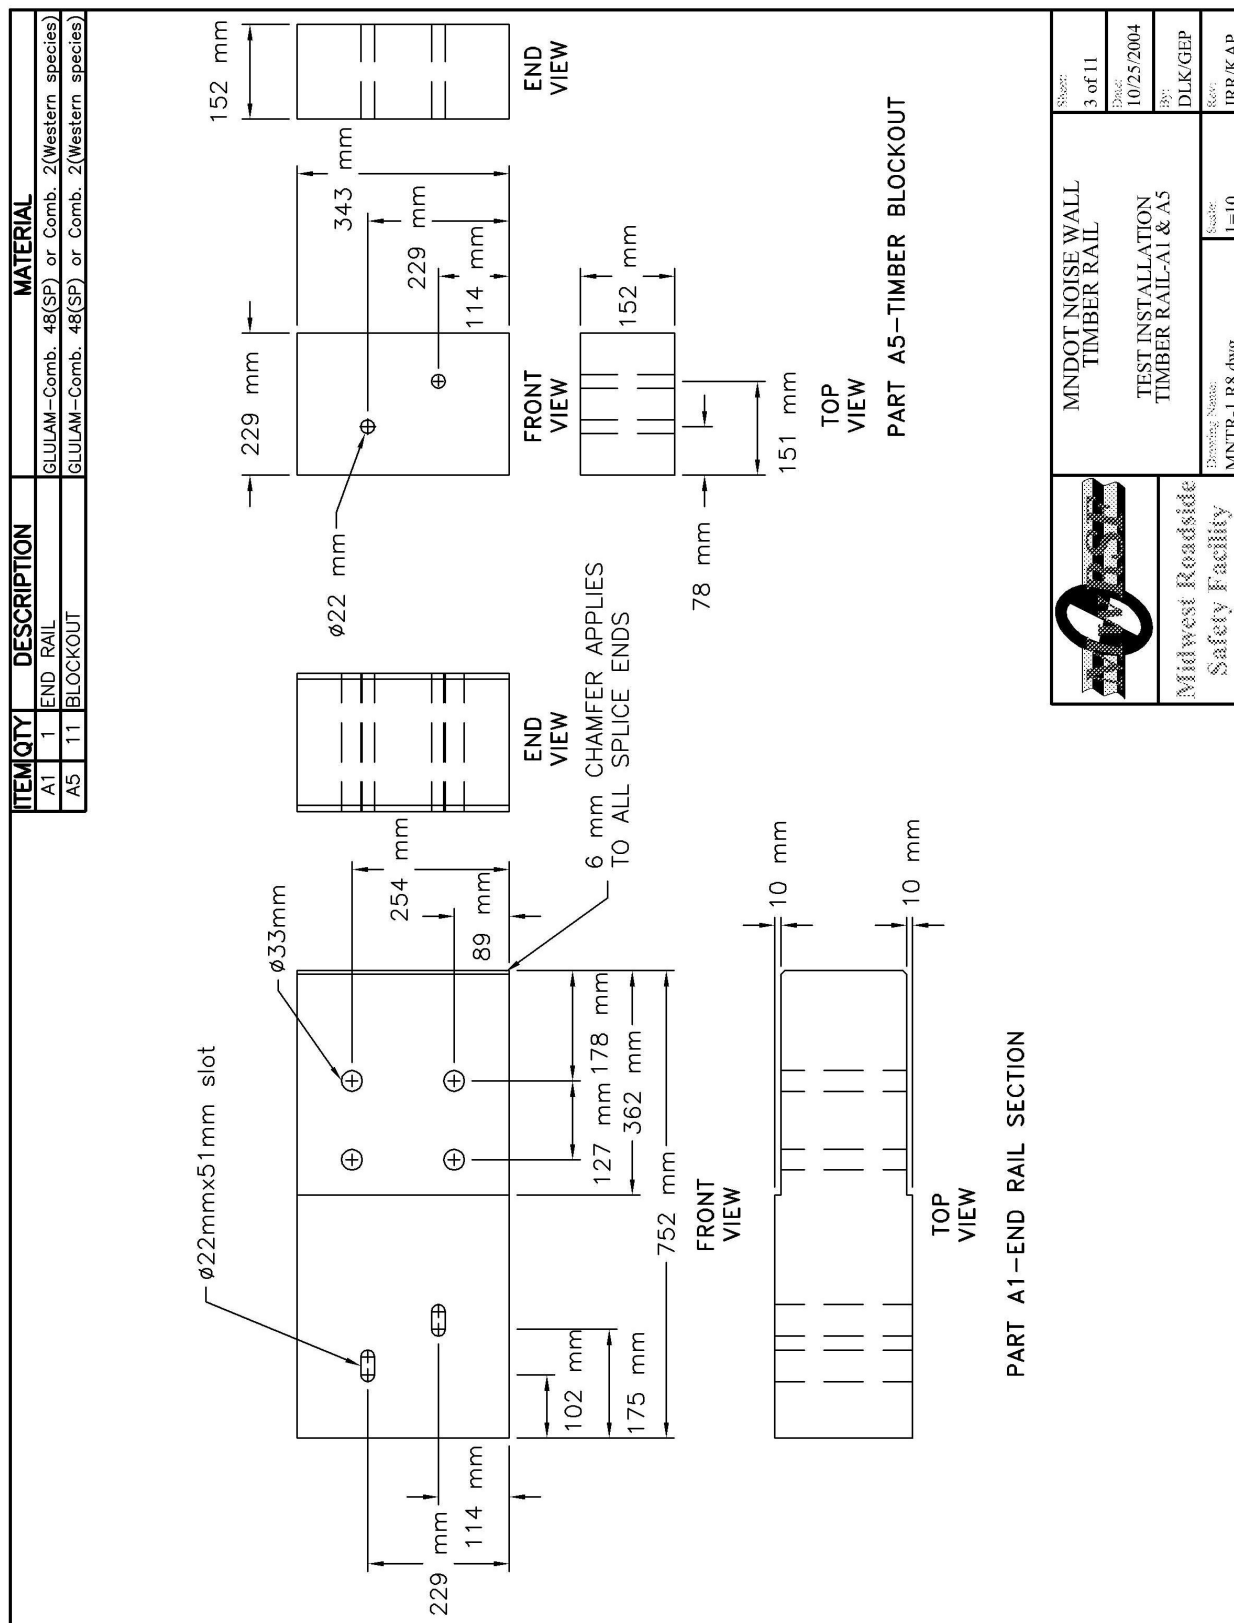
Mn/DOT's Timber Rub Rail Design Rail and Timber Blockout Details
